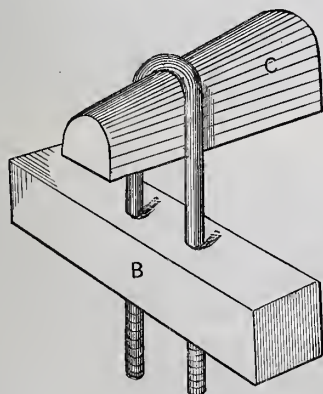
Detail of Fastening Connecting Windlass with the Derrick.
